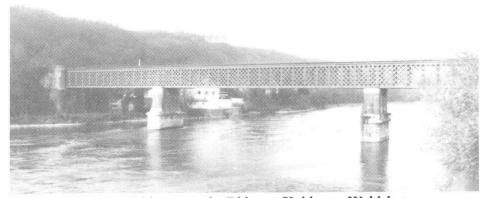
Bridge over the Rhine at Koblenz - Waldshut
